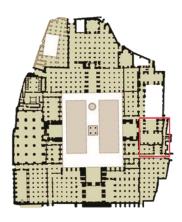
Southern Iwan of Mazafari Madrassah and the roof restoration
